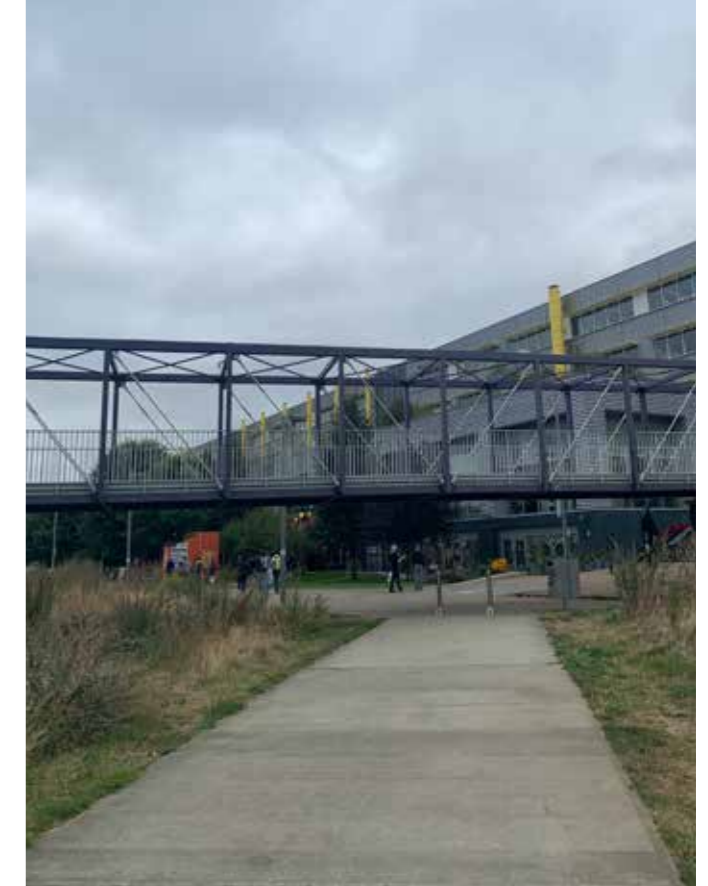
Pedestrian Footbridge at Hackney Wick, London
